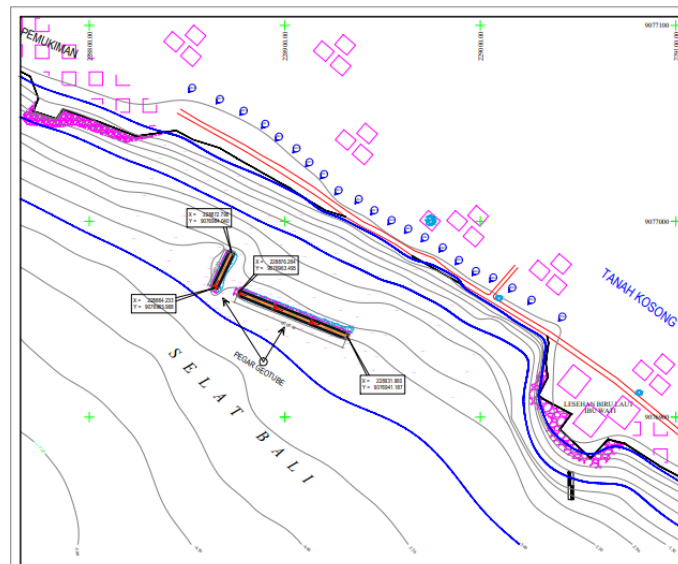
Plan view – Installation of LCB made from Woven Geotextile Tube at Pebuahan beach
